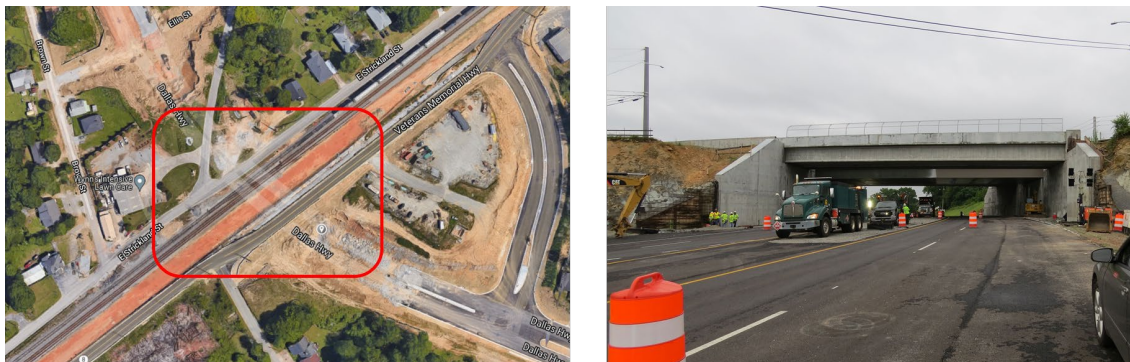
Photos. SR-92 Norfolk Southern Railway bridge construction project.
